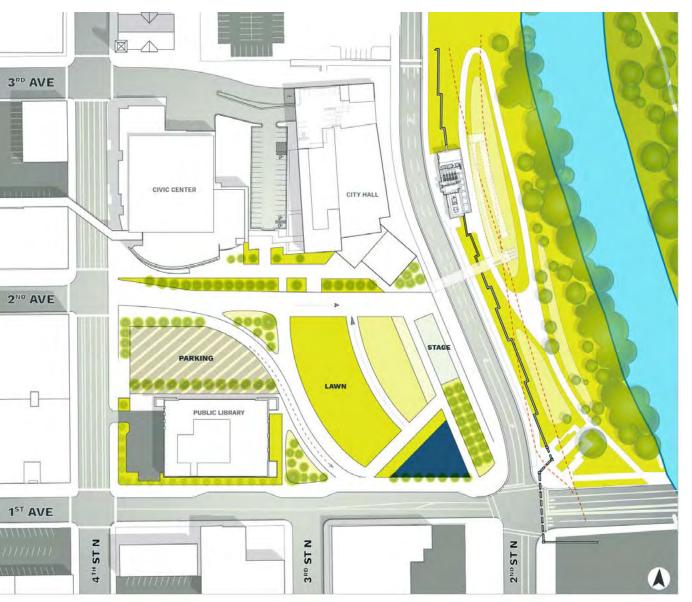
Conceptual Site Plan Alternative extending 2nd Ave through Site to River
